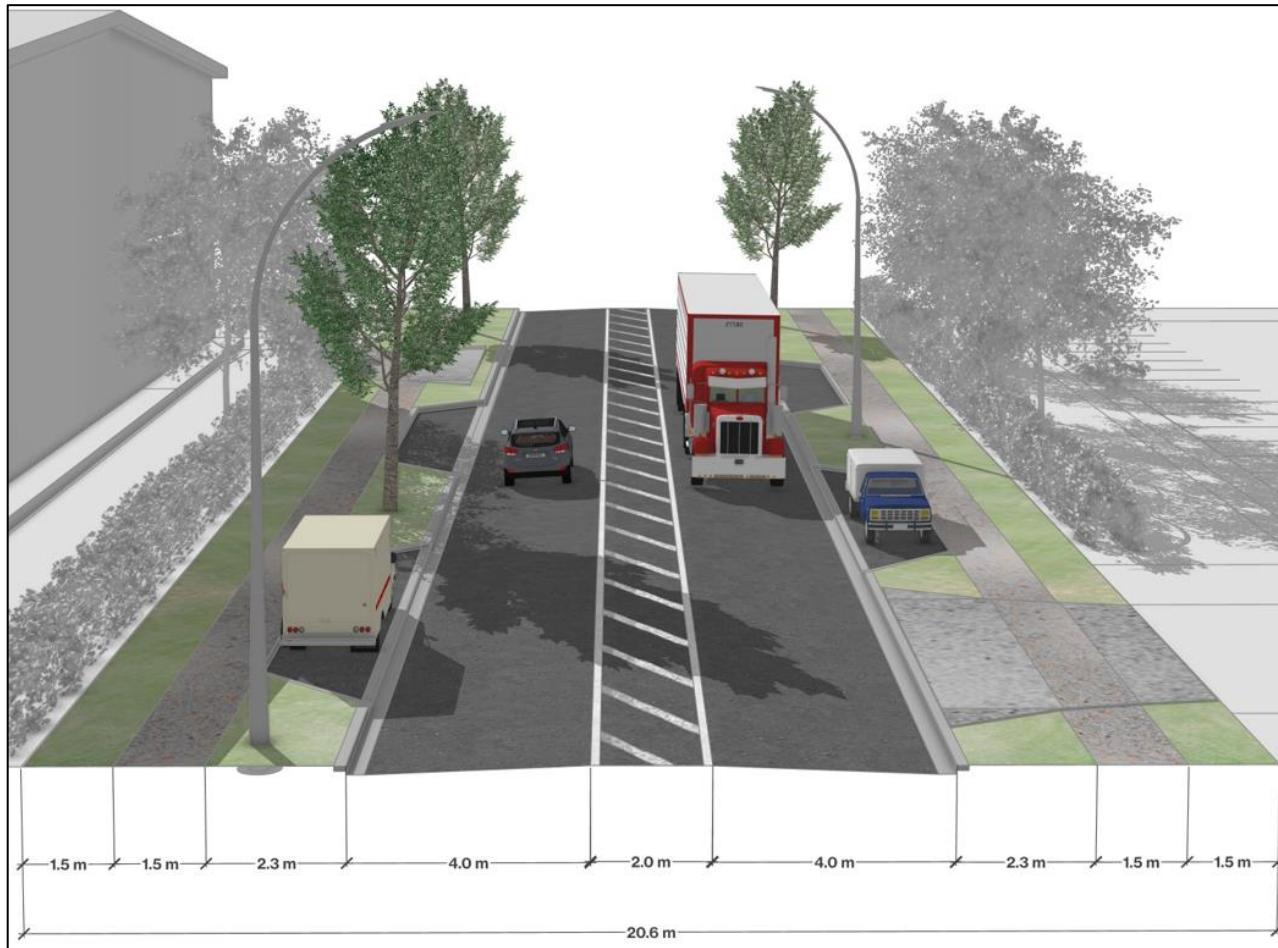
d) Indicative Typical Cross-Section for Local Roads.
